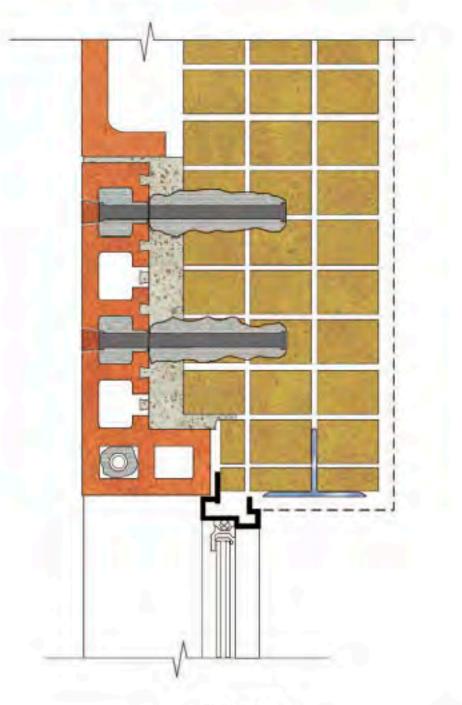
FIXING TERRA COTTA CLADDING TO BRICK BACK UP
